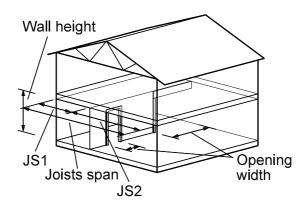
Internal Walls – Thickness of panel for wall supporting joists
